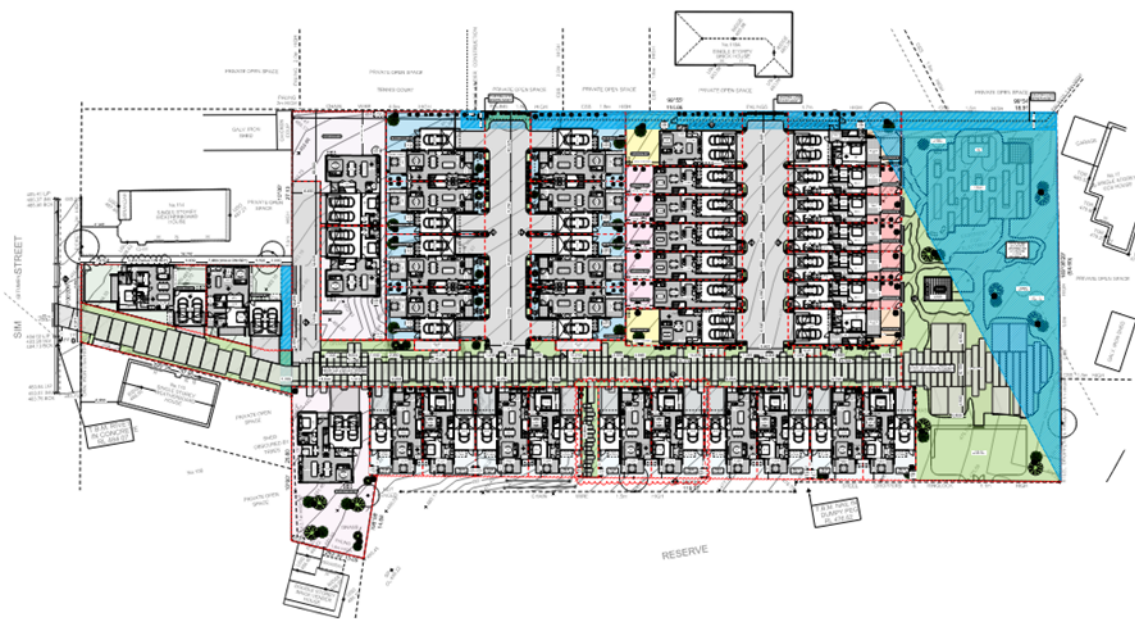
Proposed ground floor/site layout plan. *Source: application documents
